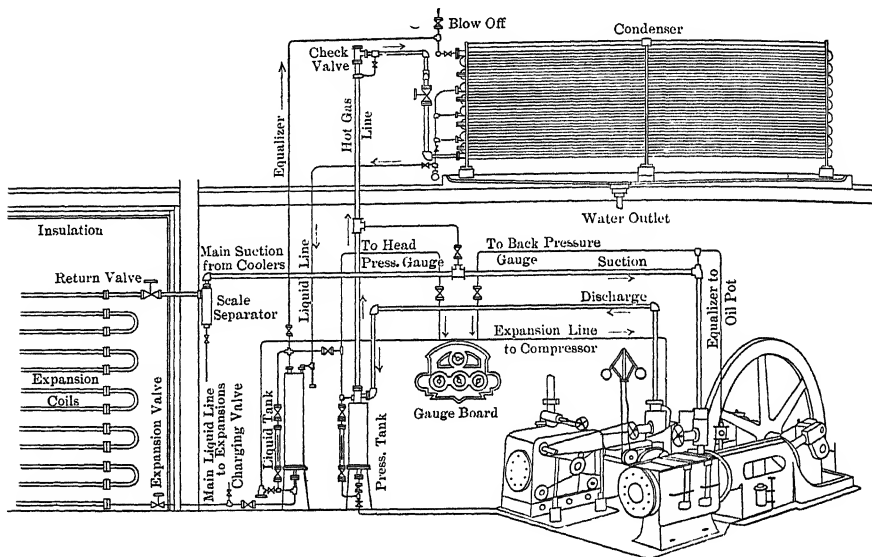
ARRANGEMENT OF VAPOR COMPRESSION REFRIGERATING MACHINE.
